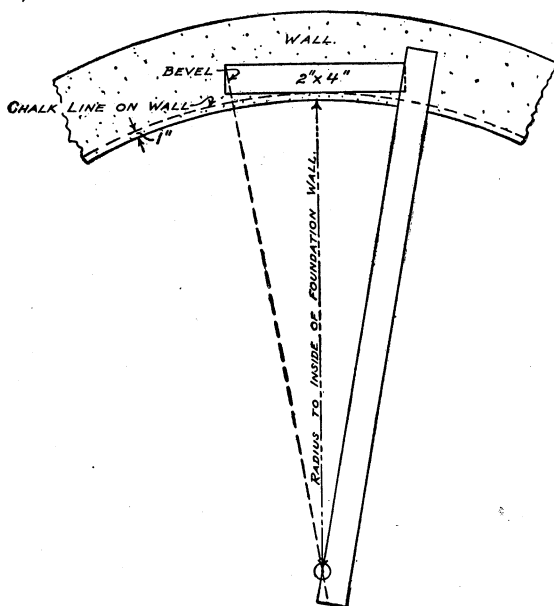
Method of obtaining bevel ends for sill and plate.
